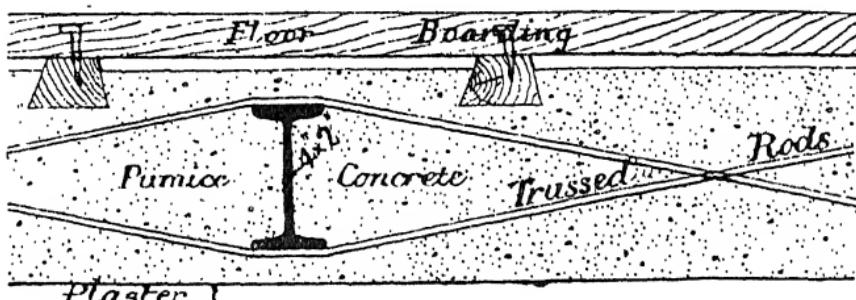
Lindsay, Neal, & Co.'s Trussed Rod Floor.
